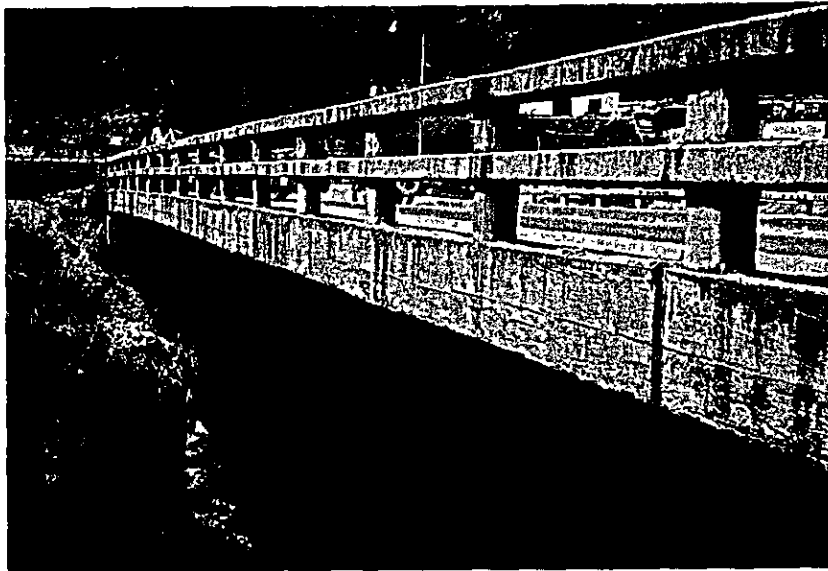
Prestressed Concrete Bridge over Rio Combeima
